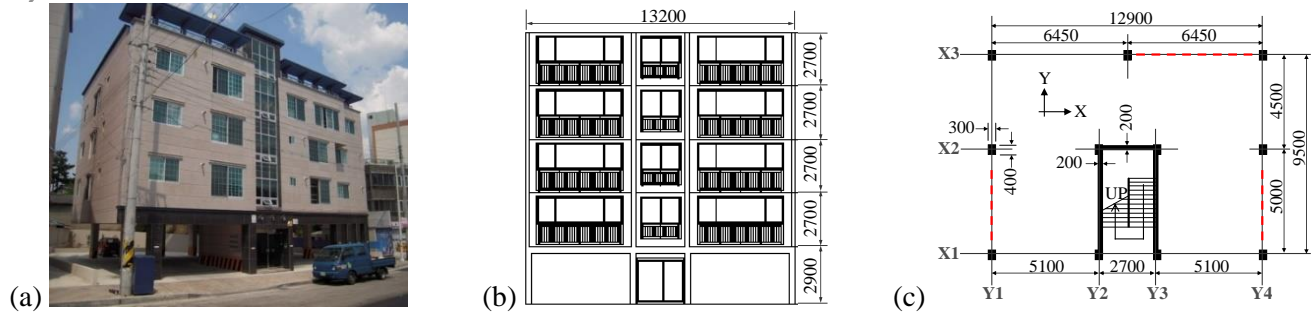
Prototype structure (unit: mm): (a) Example of piloti building; (b) Elevation; and (c) Plan of the ground floor
